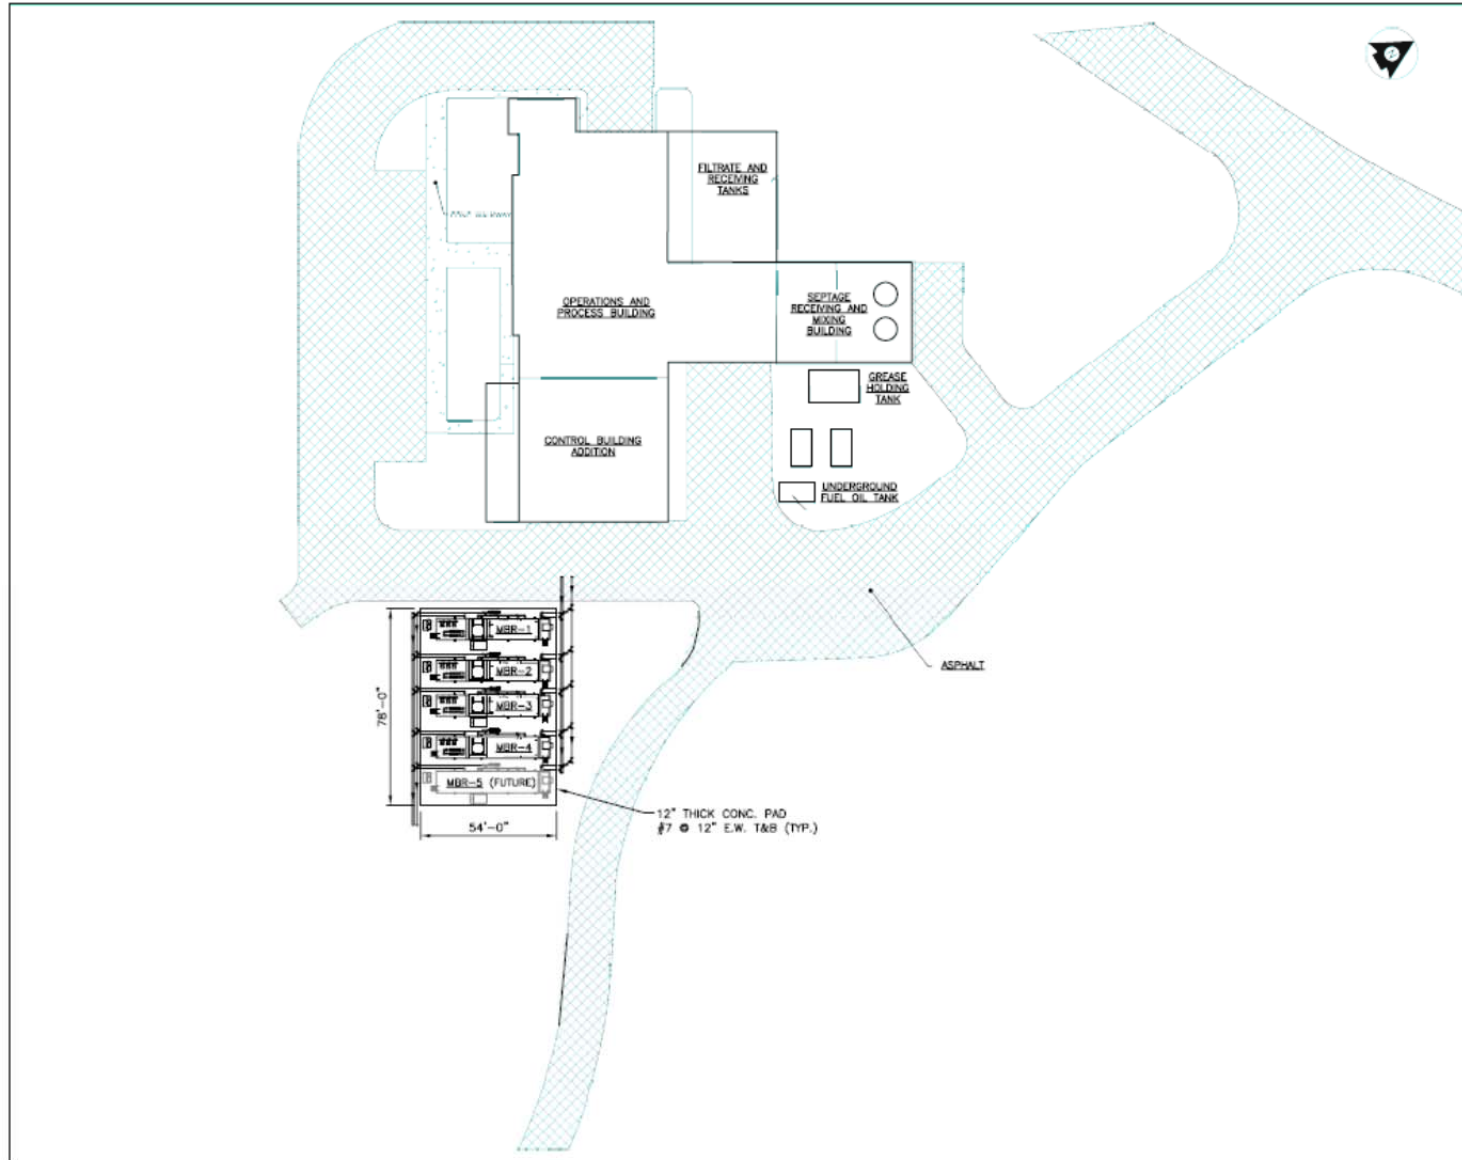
Proposed Overland Way WWTF Layout at the Former Tri-Town Septage Treatment Facility Site
